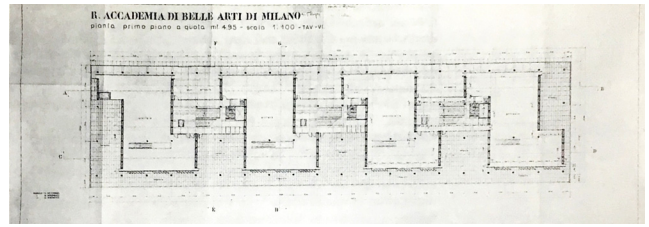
3° project, 2° Floor plan(Terragni, 1940)
